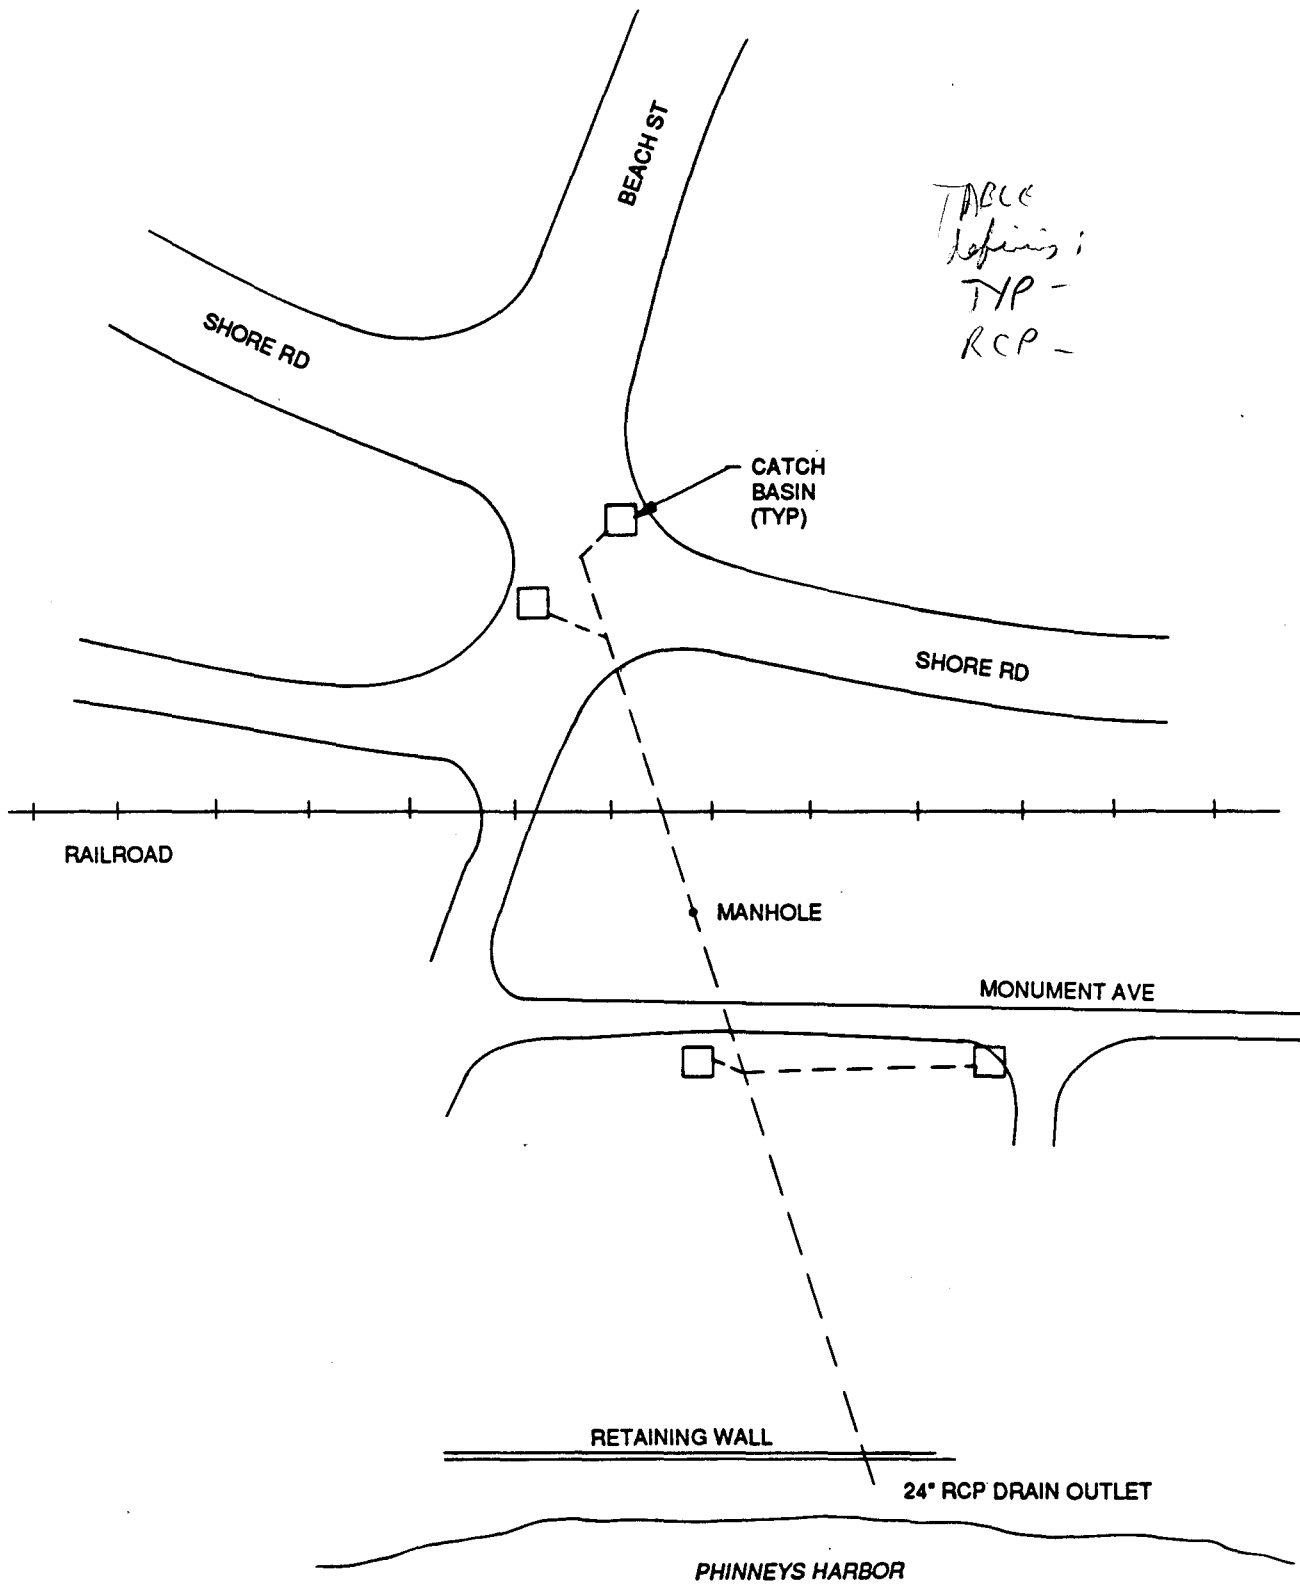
CHESTER PARK DRAINAGE SYSTEM
